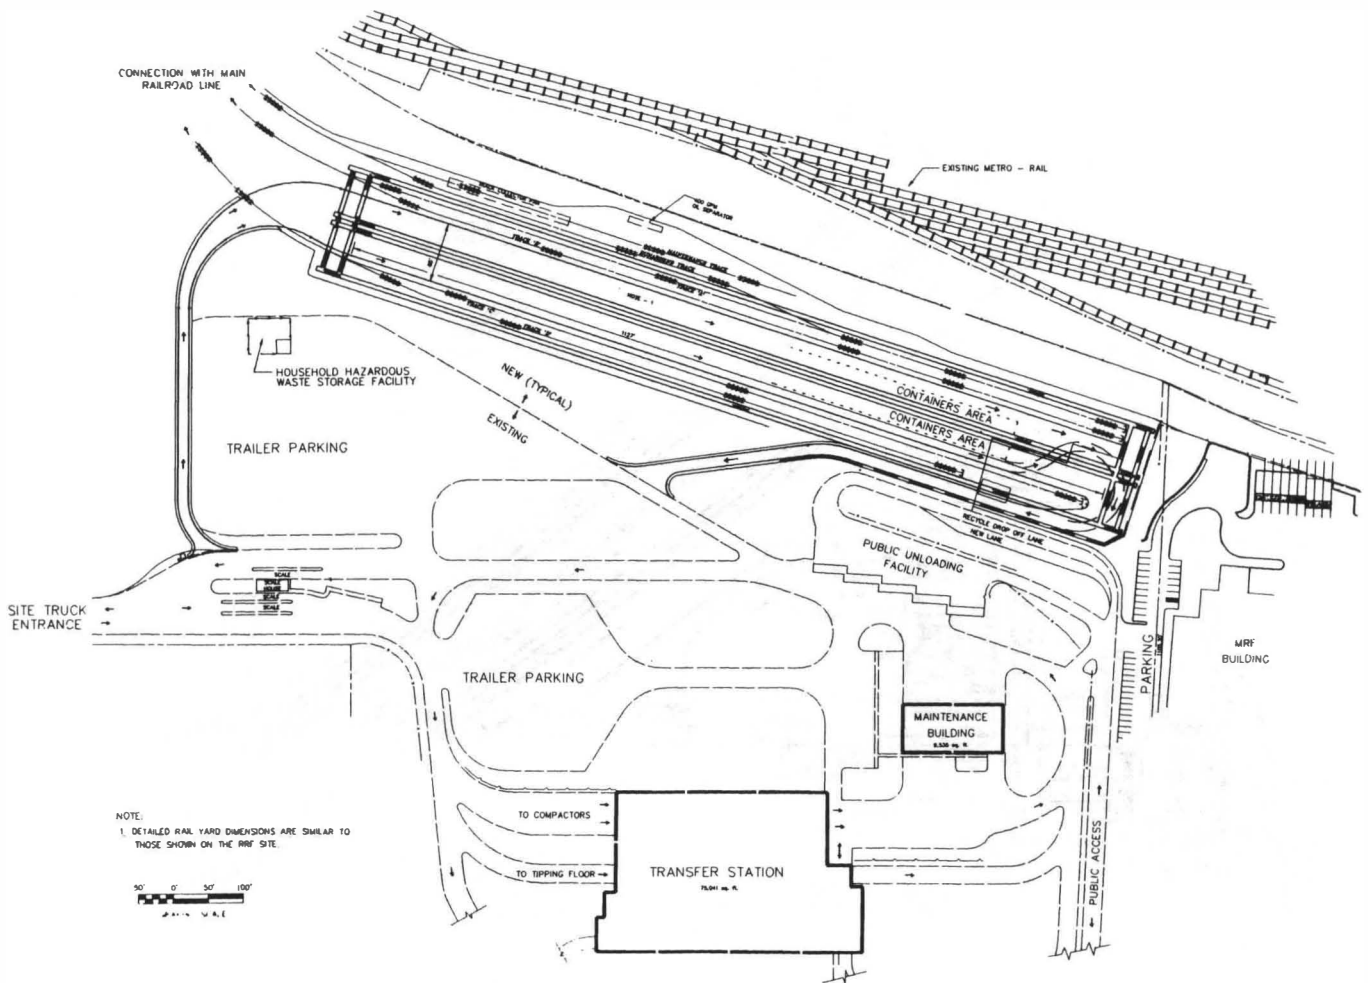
EXISTING RAIL LINE CONNECTING TRANSFER STATION WITH FACILITY
